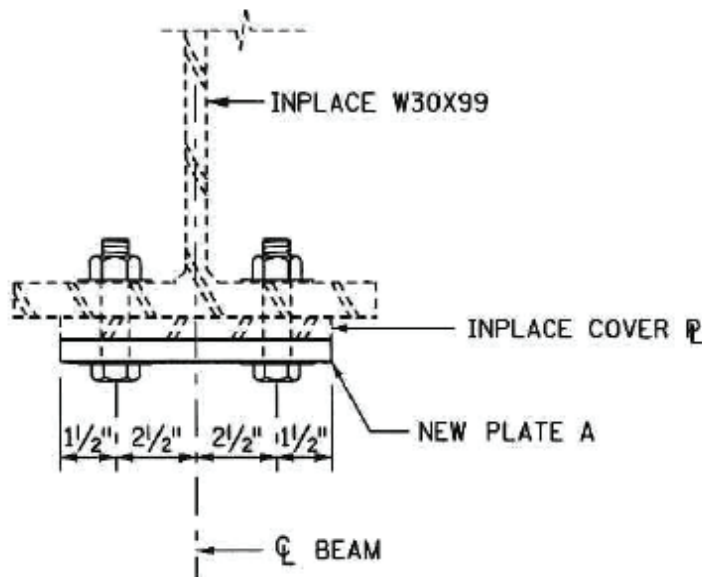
Cross-section of plating added to existing beam (Minnesota DOT)
